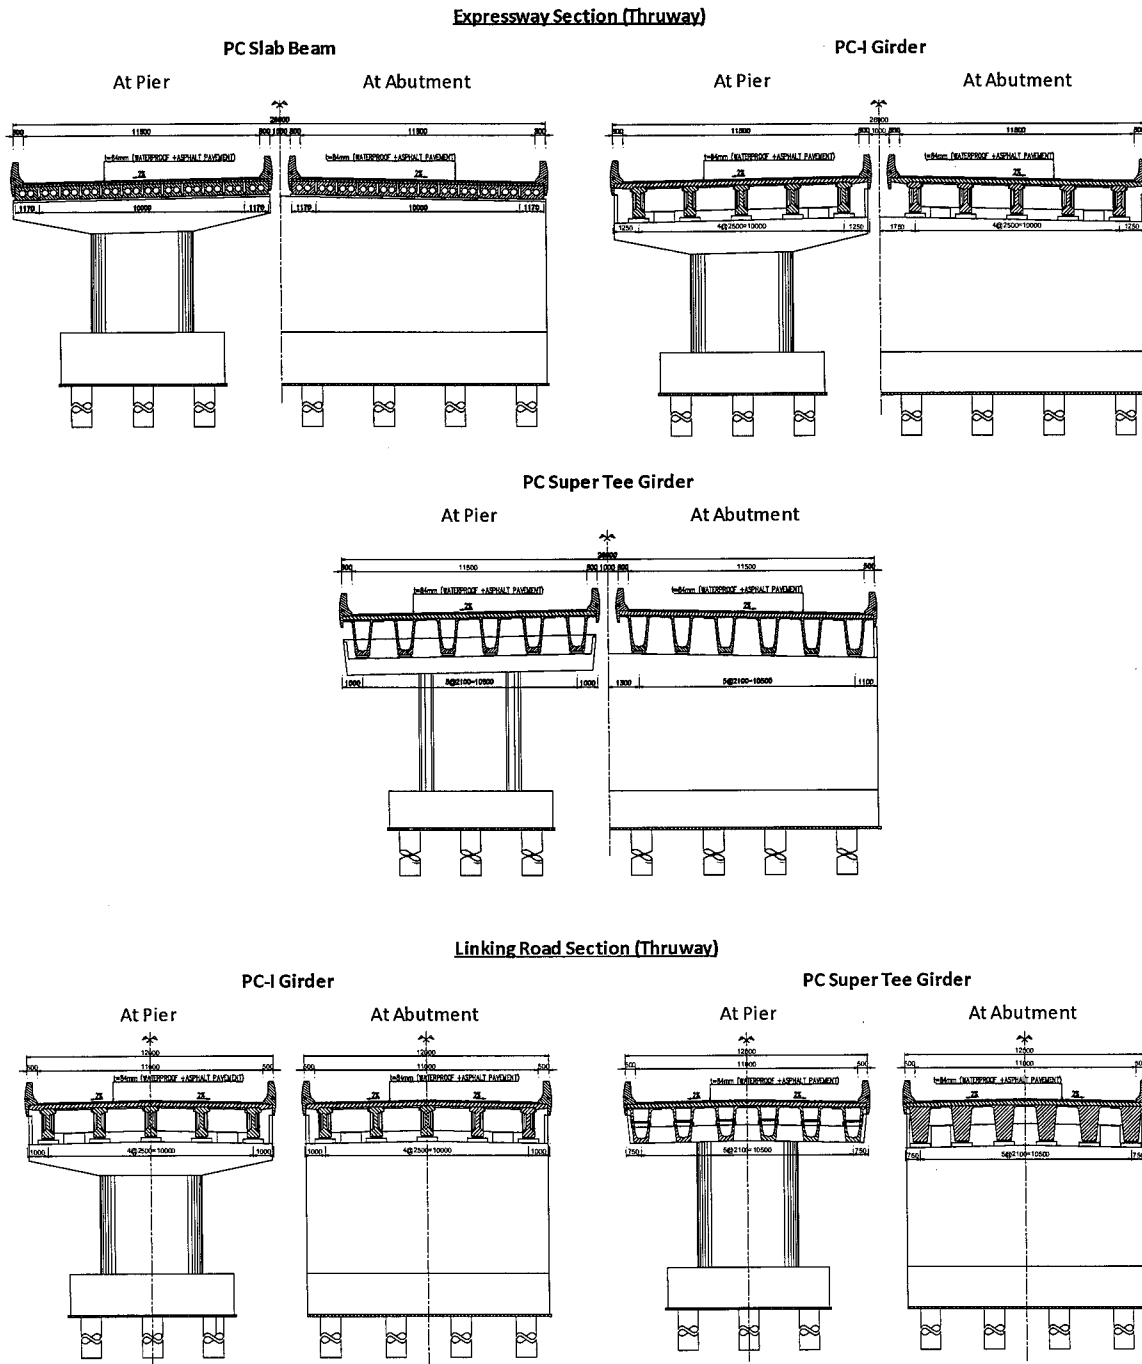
Typical Cross Sections of Thruway Bridges in F/S Plan
